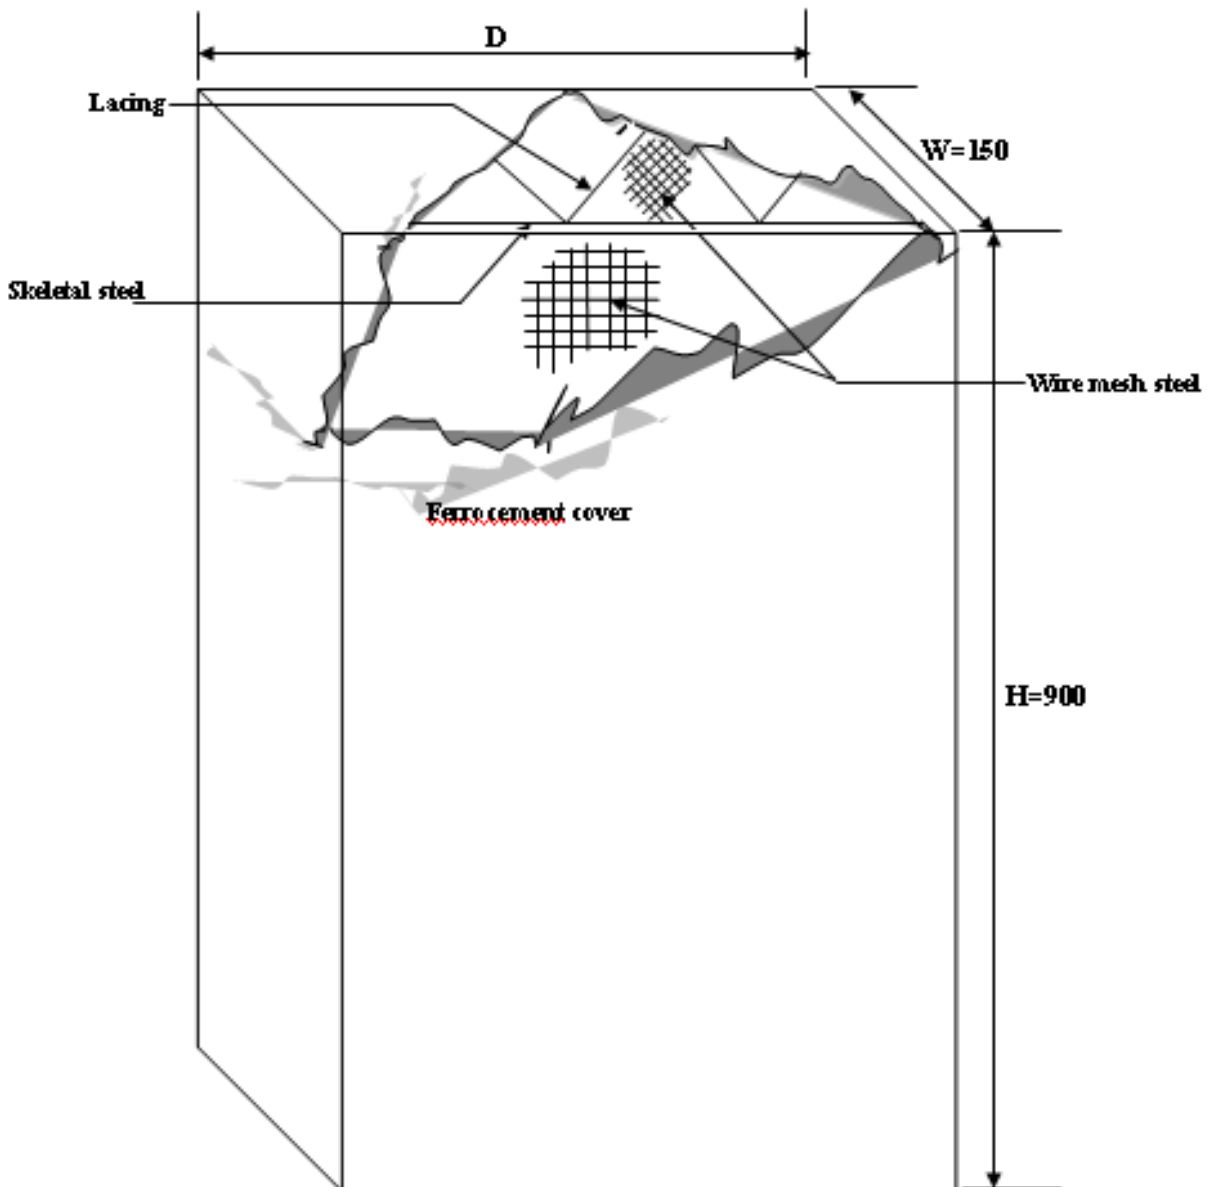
Geometry and reinforcement details of monopanel column specimens used for groups I, II and III.
